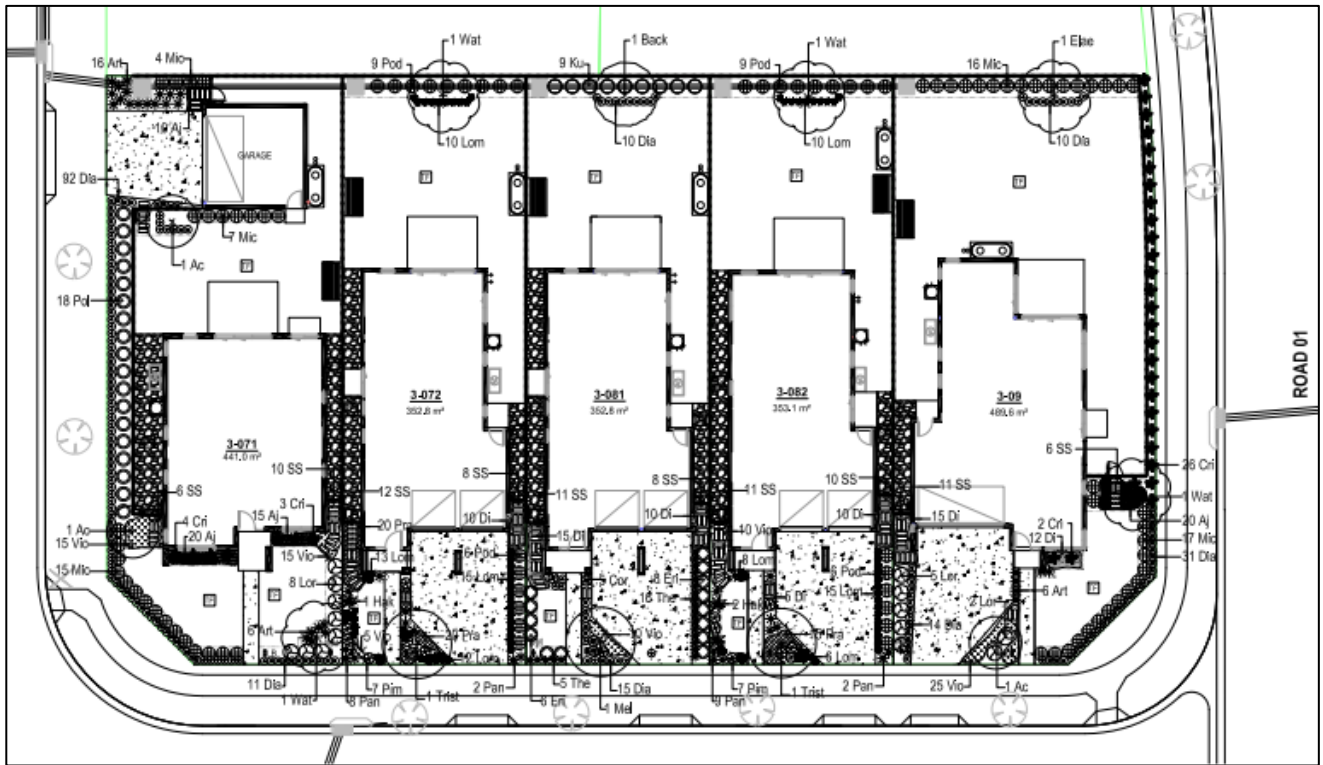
PROPOSED LANDSCAPE PLAN (PROPOSED LOTS 3-09, 3-071, 3-072, 3-081, 3-082)
